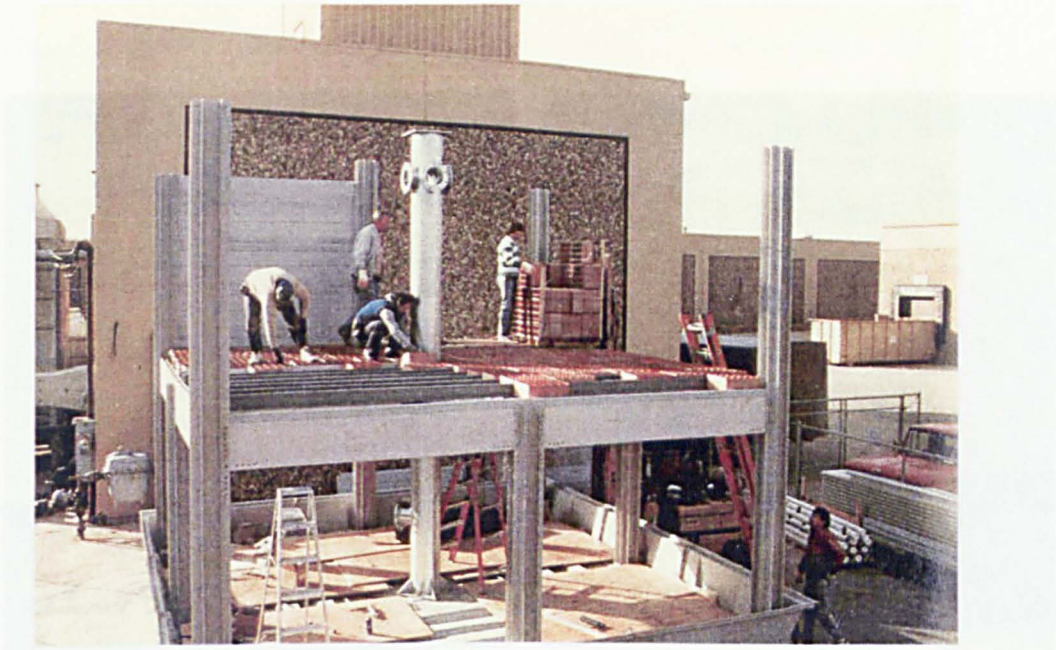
Cooling Tower built with pultruded GRP beams and columns.
